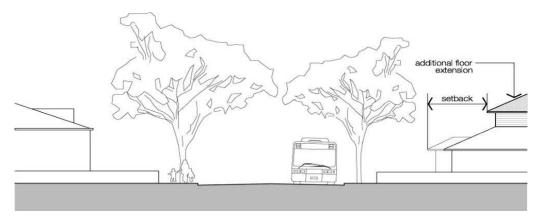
An example of alterations and additions which are sensitively undertaken and are within the existing envelope. First floor additions are set back in order to minimise the impact upon the street character
